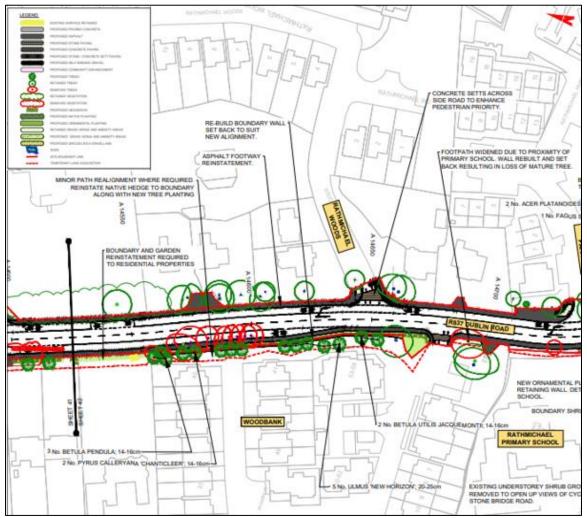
Extract from Landscaping General Arrangement Drawings at Woodbank (Sheet 42)
